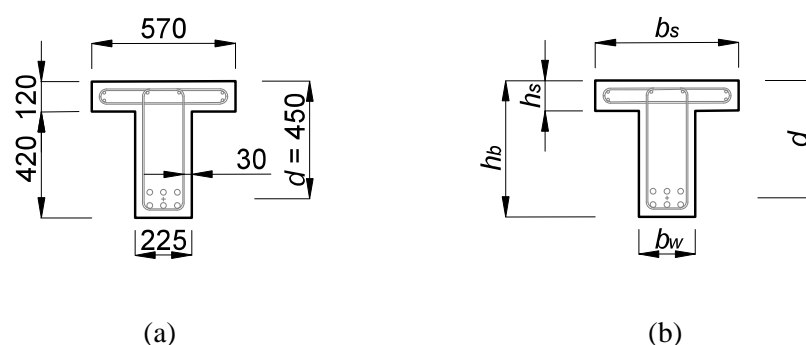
Modelled T-beam geometry – through section: (a) as tested, (b) schematics of modified T-beam geometry [mm].
